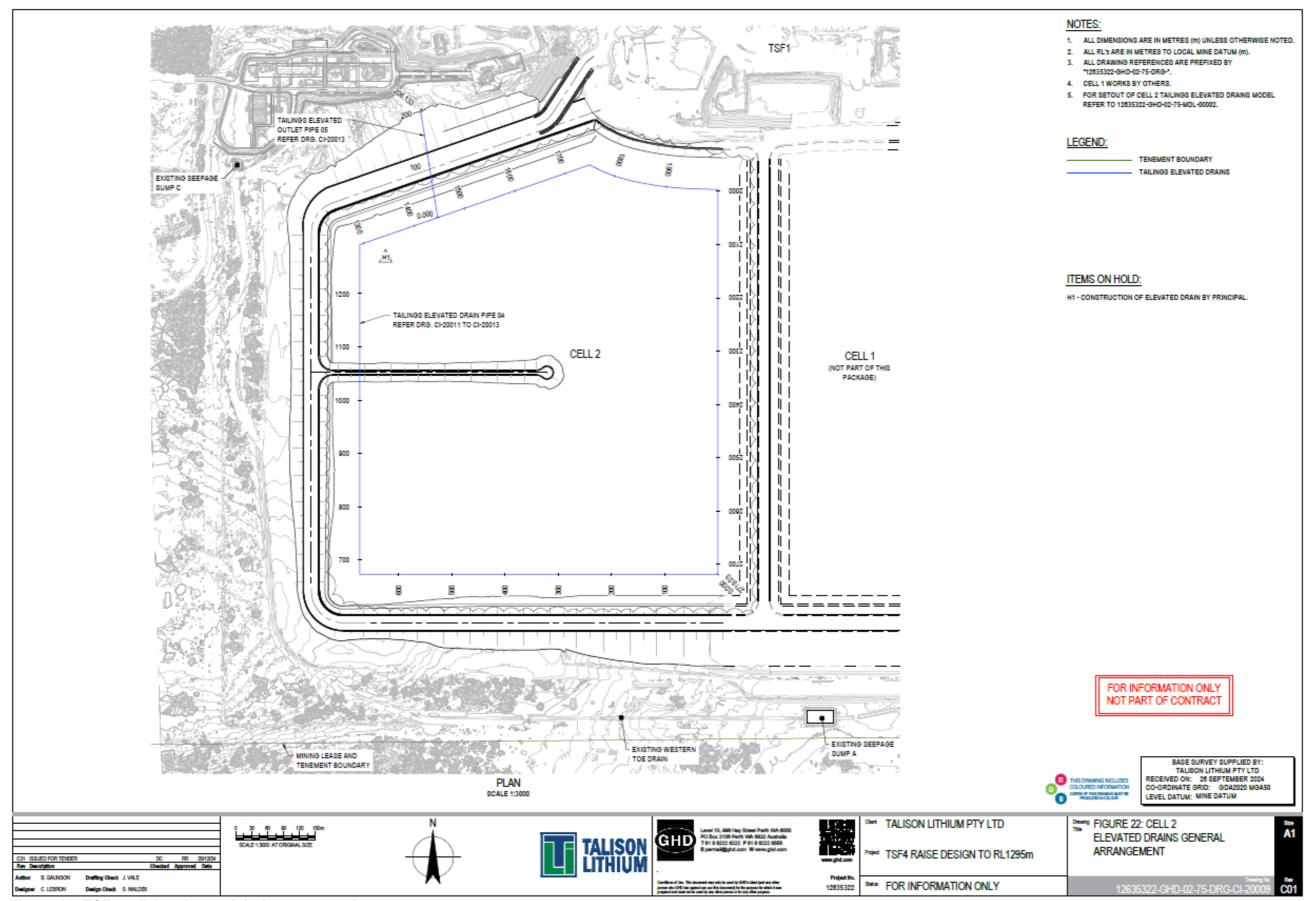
TSF4 cell 2 – elevated drainage general arrangement
